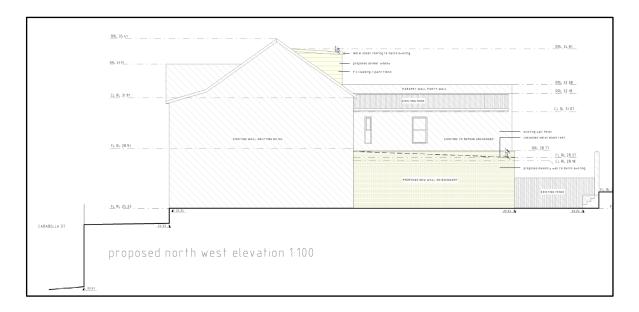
Ground floor addition and attic room dormer window – Northwest elevation
